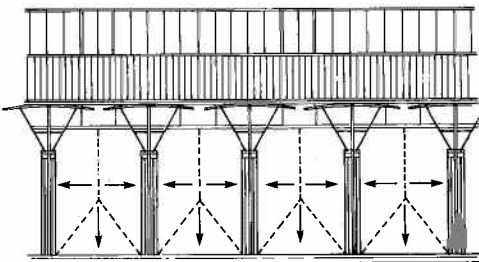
Wind load distribution on masonry – side wall of warehouse building
